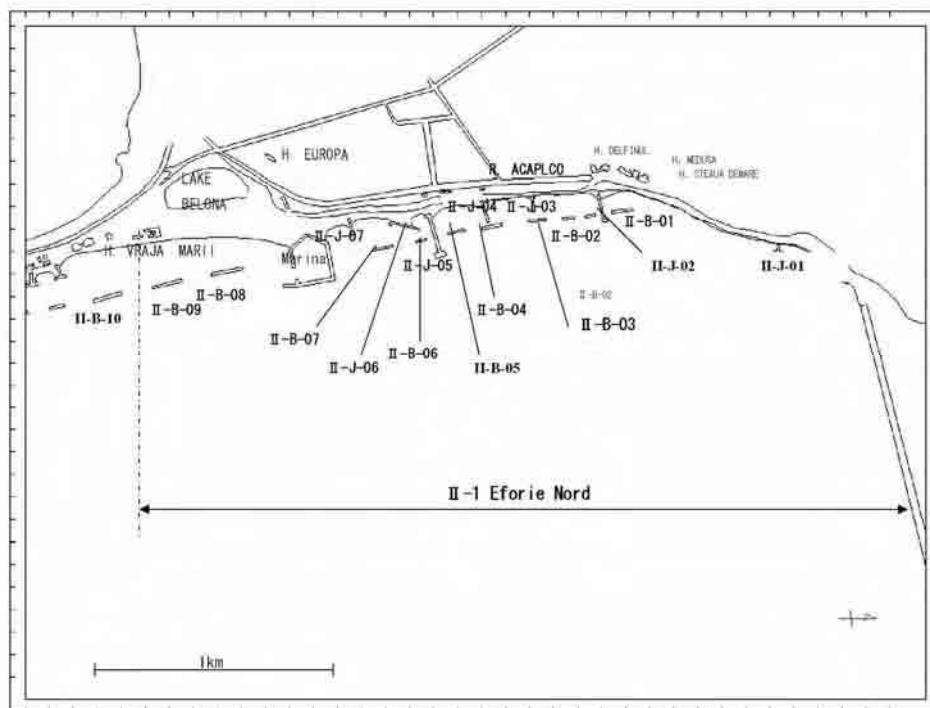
Location map of existing shore protection facilities (4)
